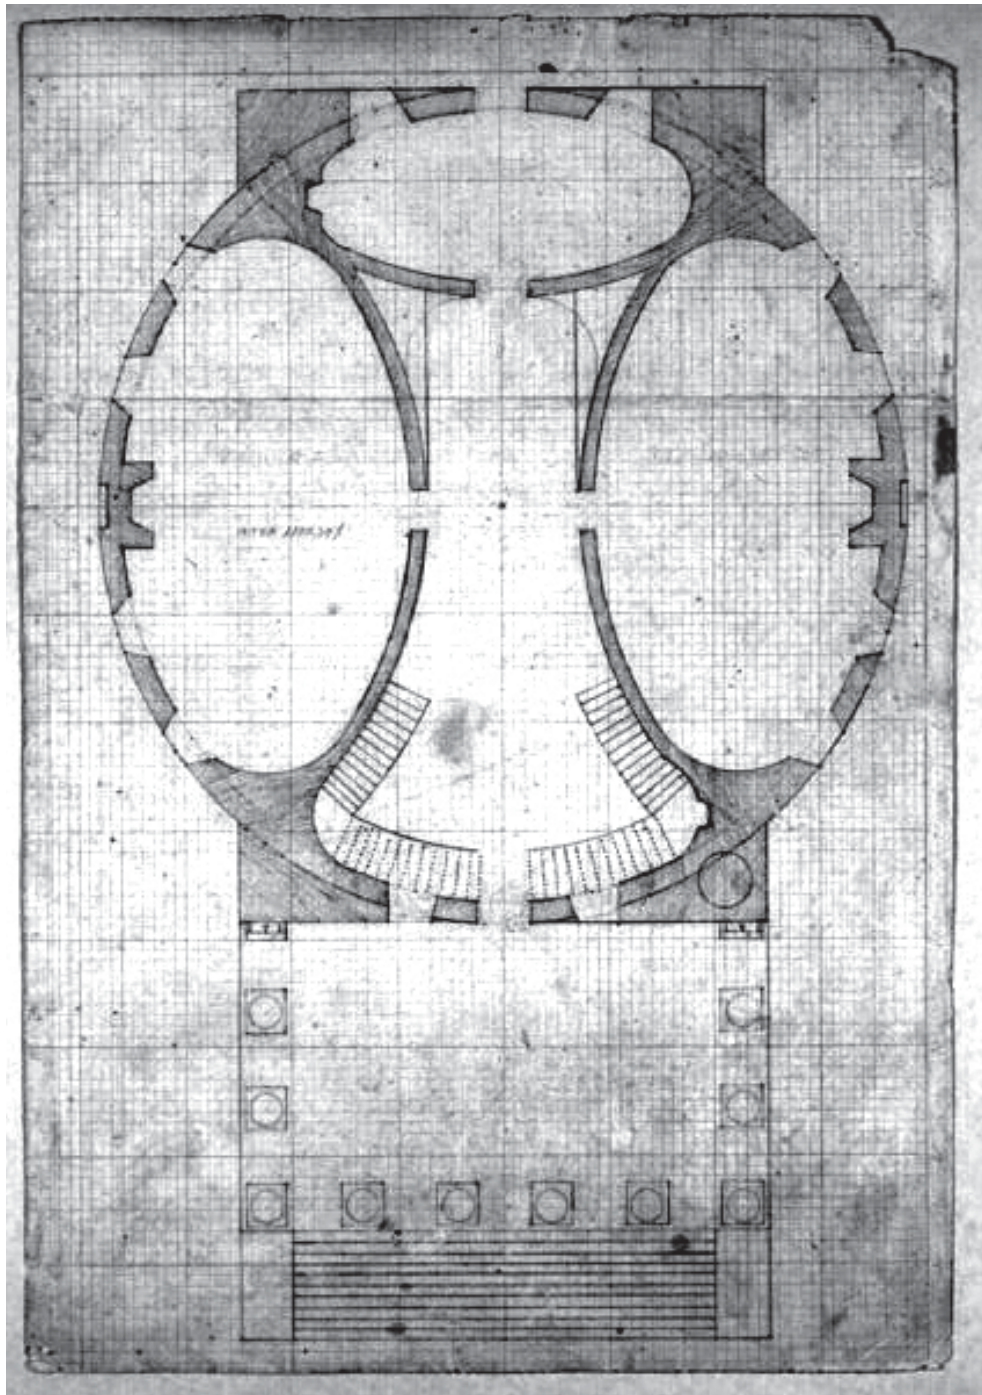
Jefferson's main floor plan of the Rotunda, begun 1818, completed by March 29, 1819. [Jefferson Papers]
